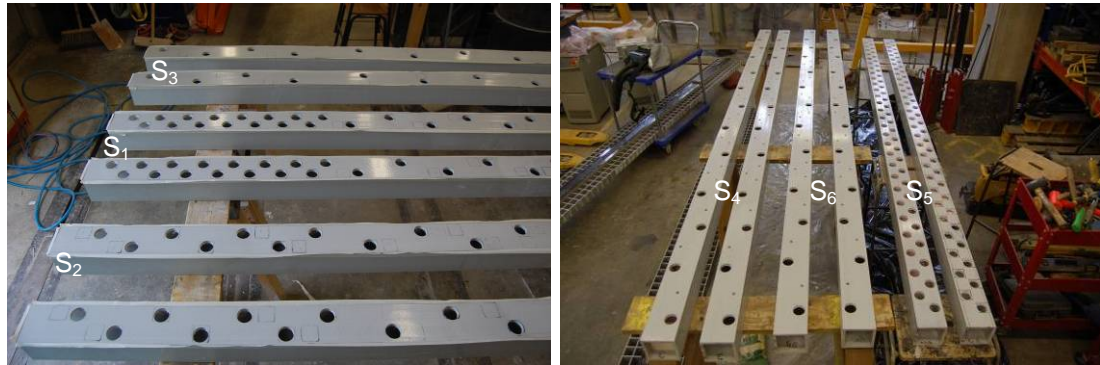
Layout of ‘zig-zag’ pattern holes on top flange of box sections in specimens S_1 to S_6
